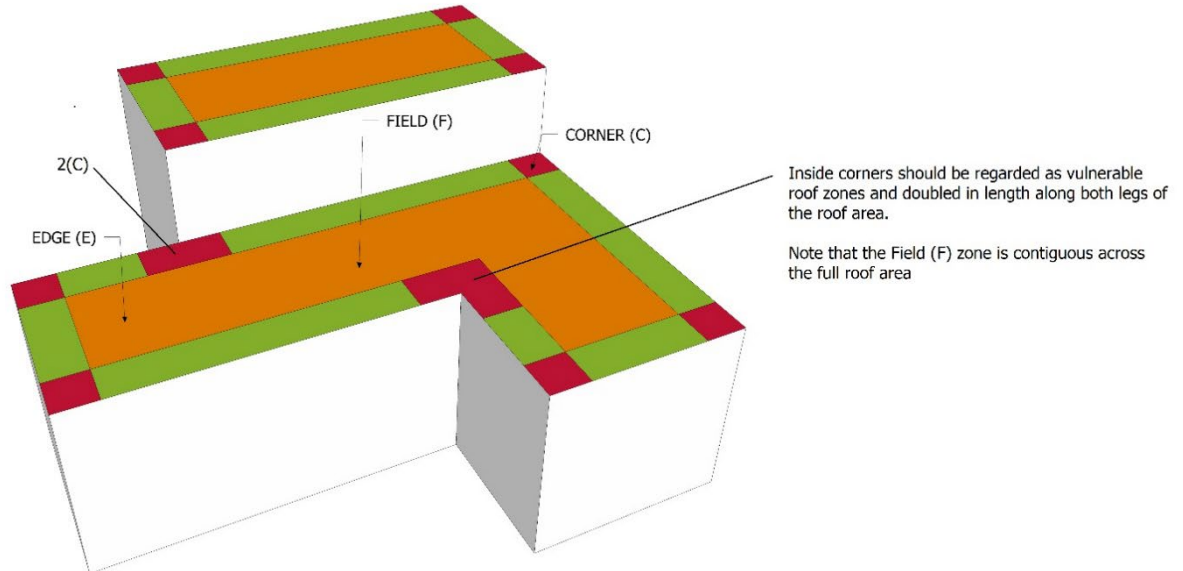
NBRCA/MRGNB recommended zone layout for roof design with multiple roof heights and L-shaped building
